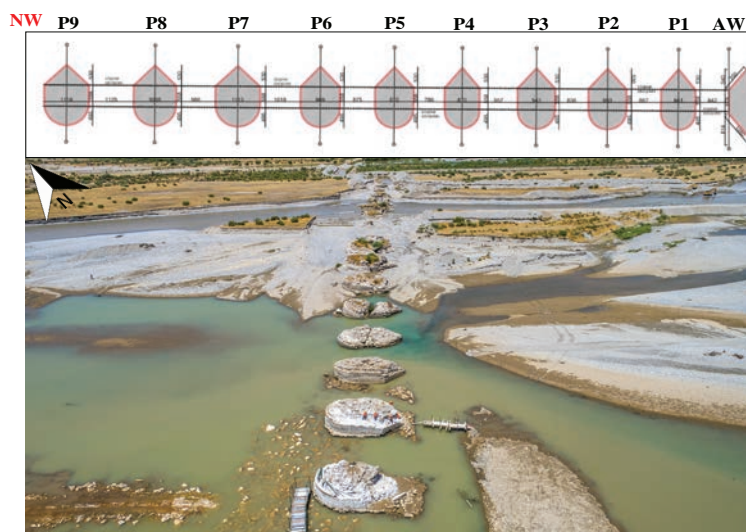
(up) A drawing indicating the dimensions of the approach wall (AW) and some of the piers (P); (down) an aerial view of the ruins and Batman Stream
